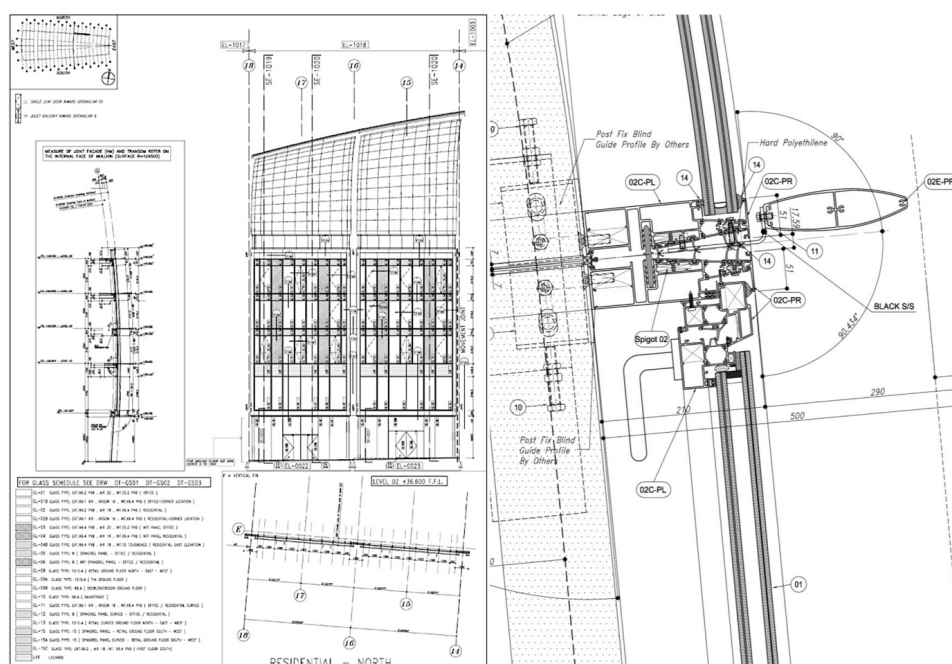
Drafting of the “positioning plans”, as instrumental tools to govern the “modelling” of the “technological sub-systems” and technical interfaces (Robin Partington, Park House, London).
